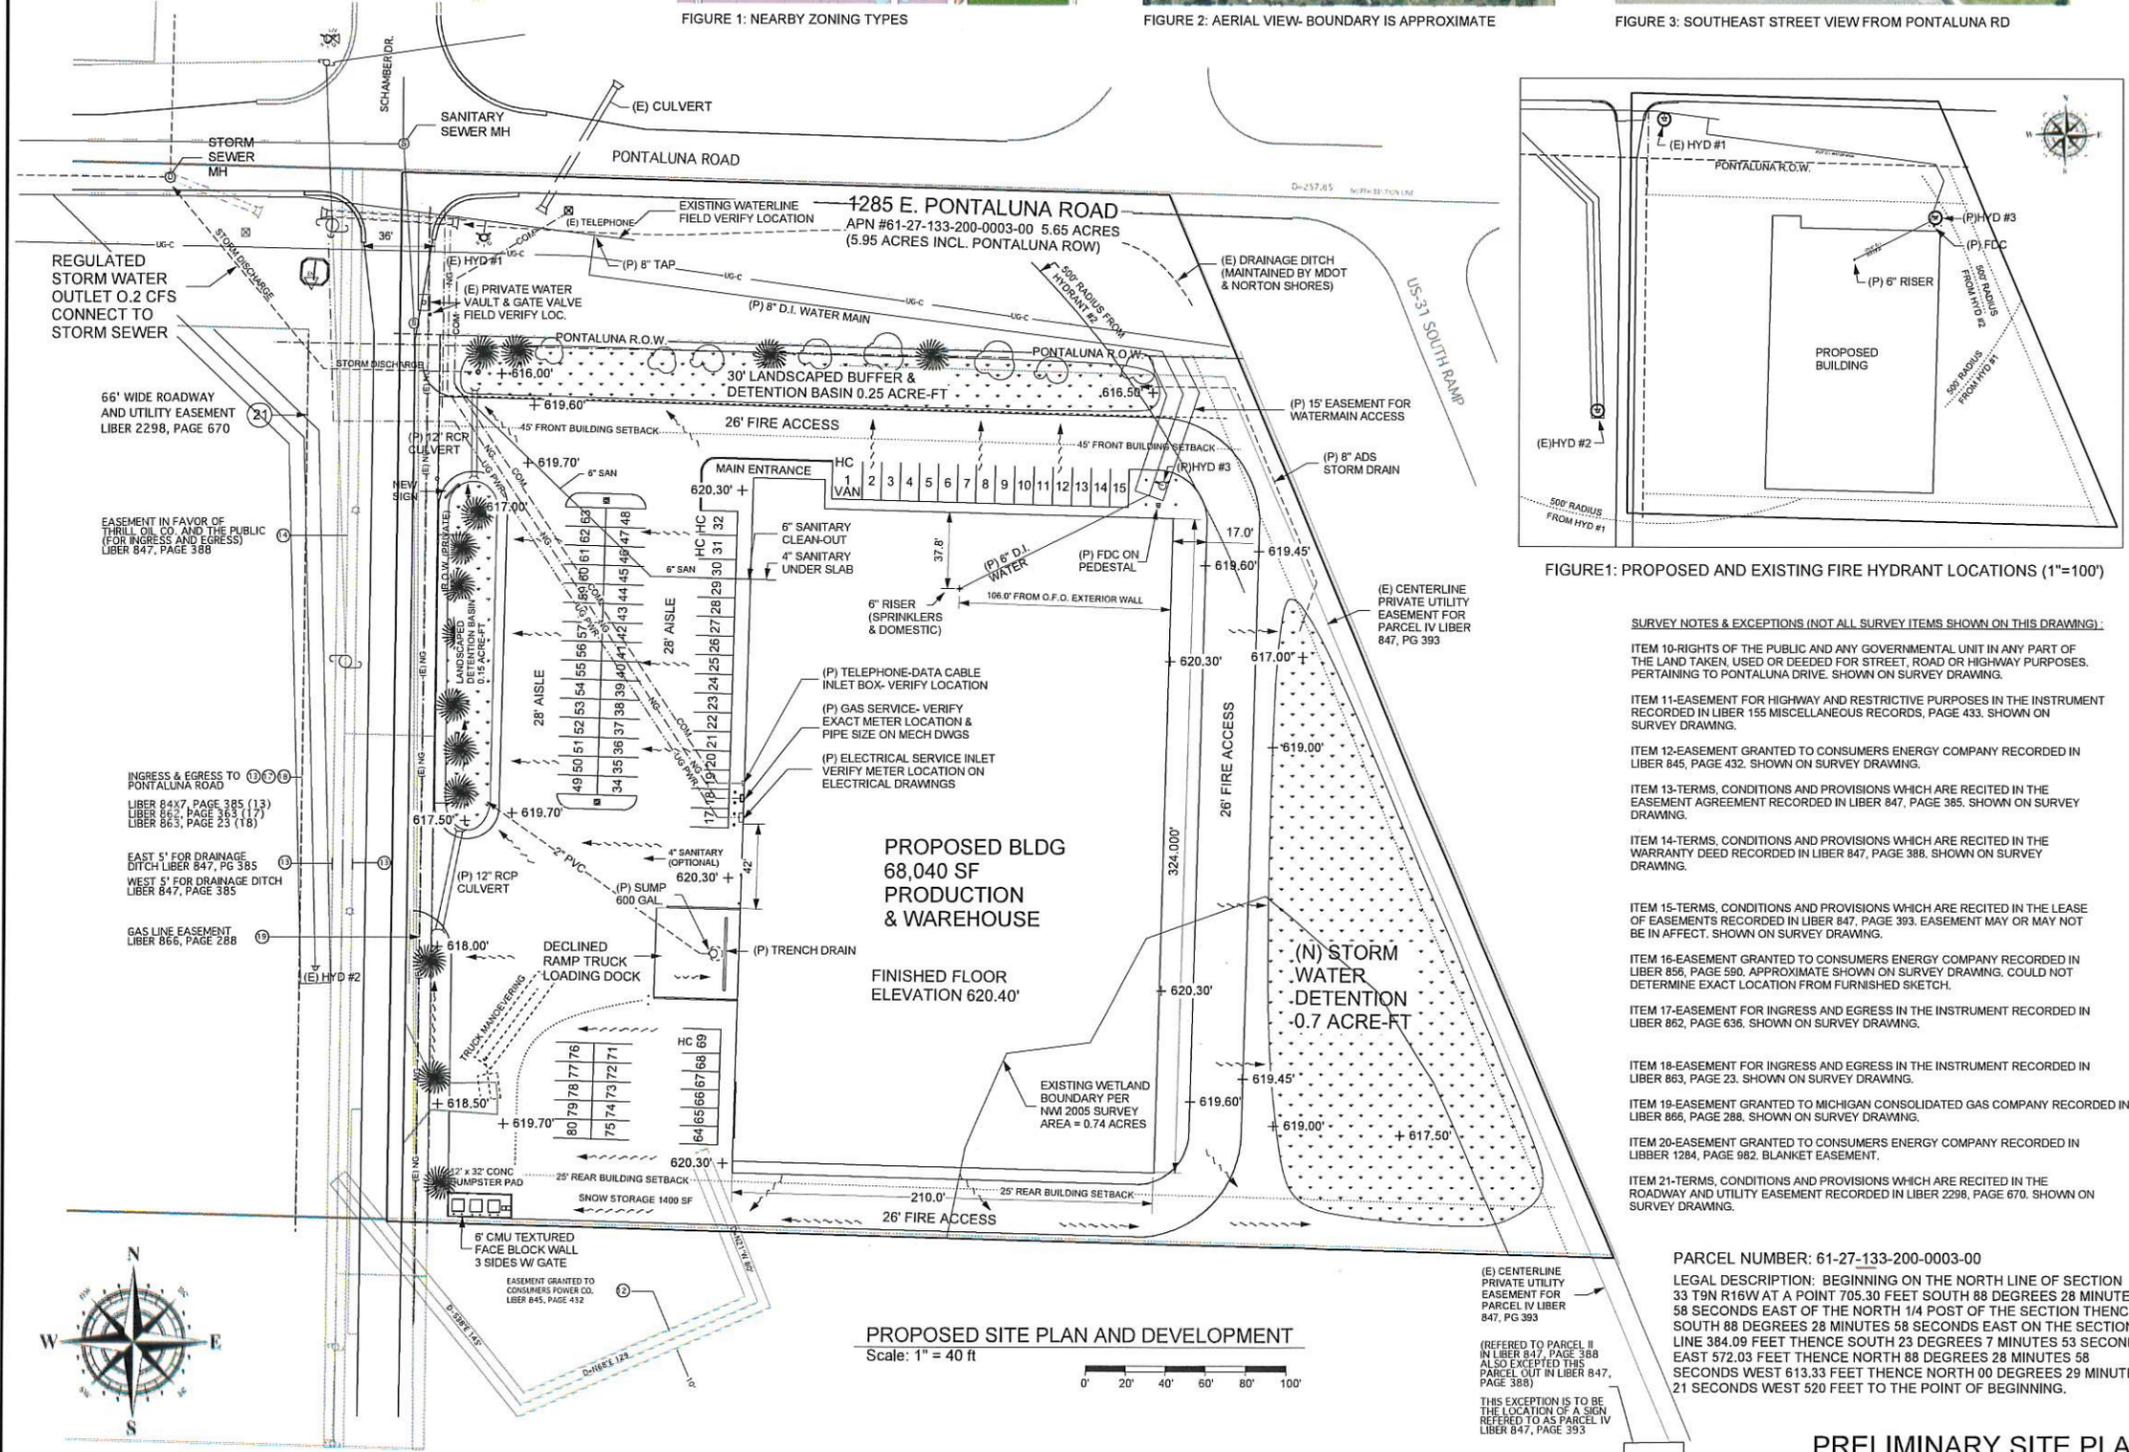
PROPOSED AND EXISTING FIRE HYDRANT LOCATIONS (1"=100')
